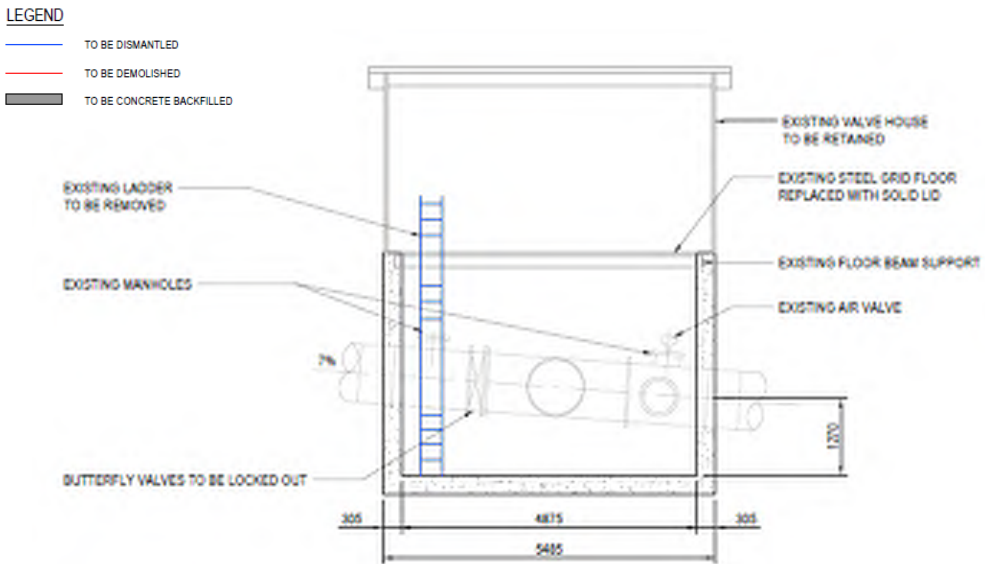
Typical cross section of High Level Outlet Pipes – Option 1D
